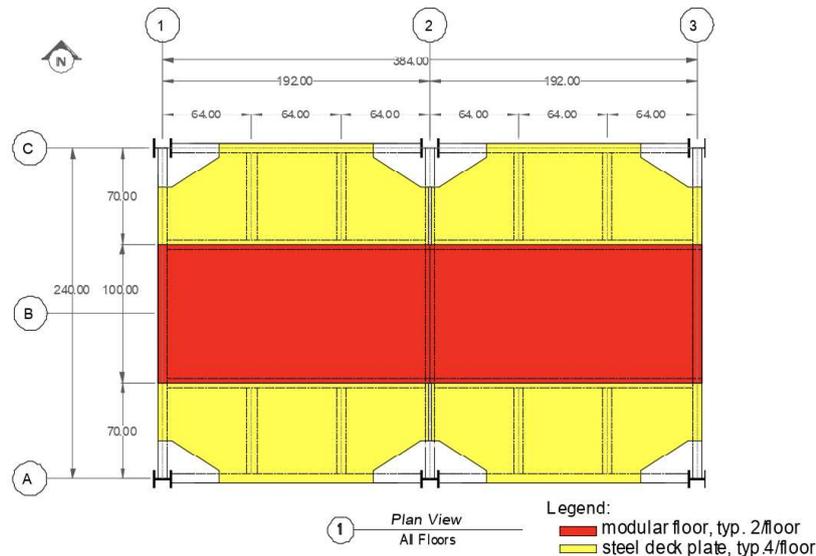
Typical floor plan of the MTB². All units in inches (1 in. = 2.54 cm).
